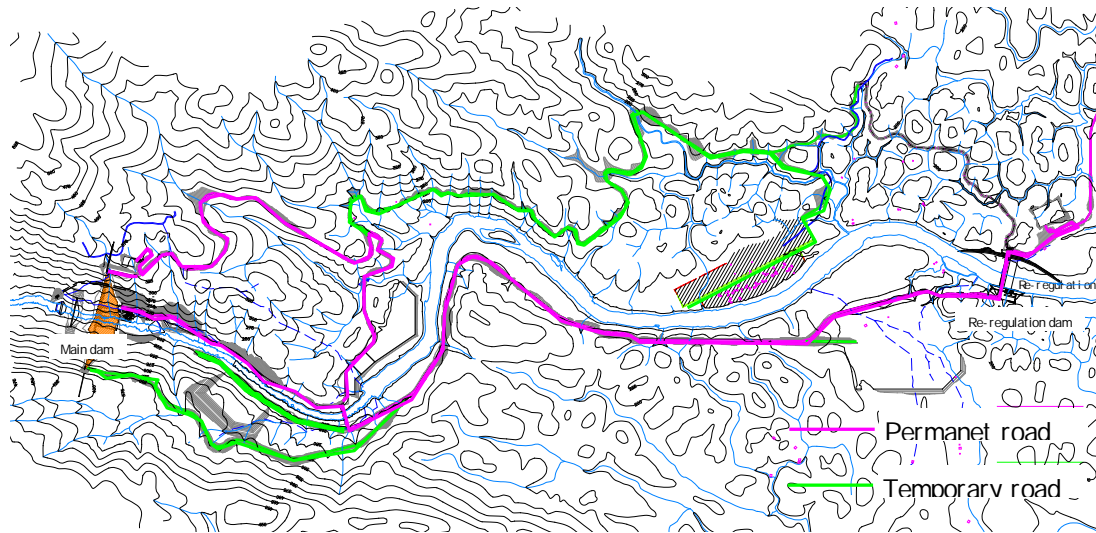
General layout of access road within the Nam Ngiep1 Hydropower Project
